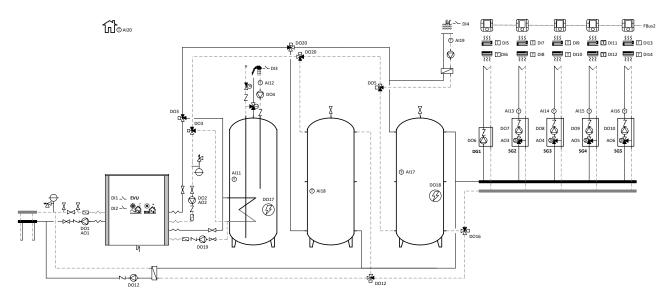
Wiring scheme using two buffer storage tanks (ecoGEO+ HP3 models).
